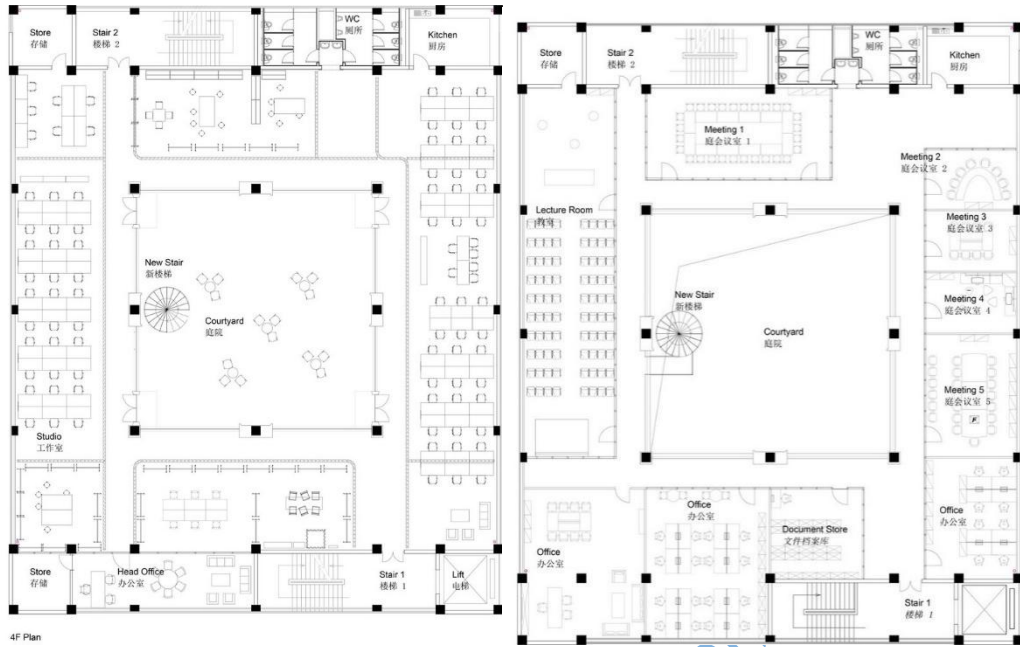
& 3.10: Figure Showing the Renovated Ground Floor & Upper Floor Plans (Google Search, 2023) Source:
